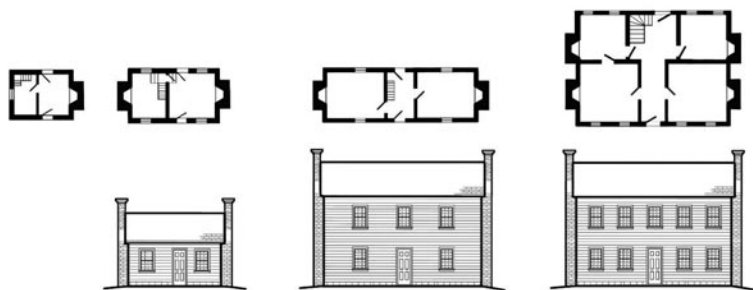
Floor plan and elevation drawings of the Hall-and-Parlor house (left) and “T”-house typologies (middle and right). Drawings by Miranda Moen, 2024.
